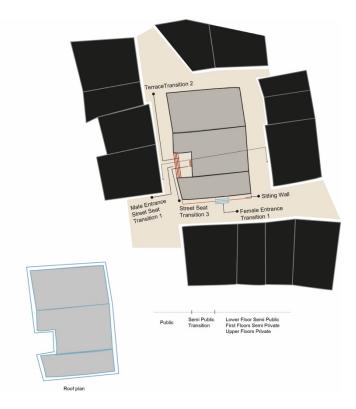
Indicating the visible thresholds in the plan and their relationship to the street and surrounding buildings. Source: Author.
